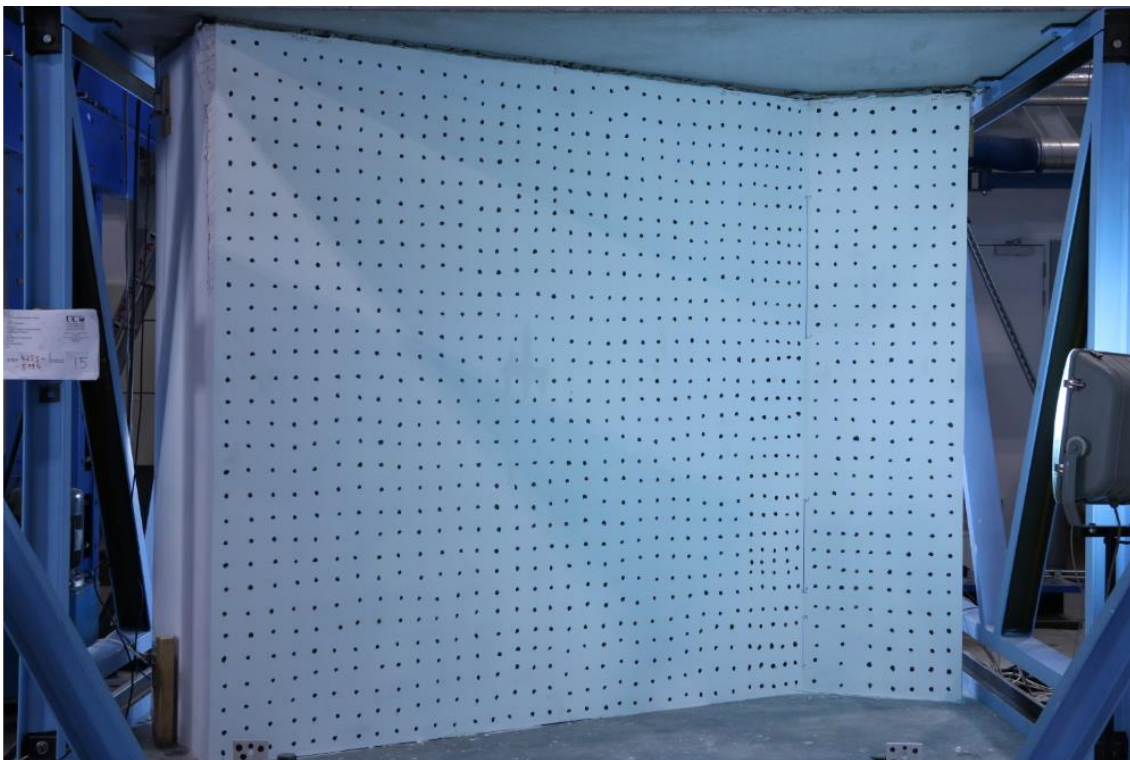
Specimen A2 – Specimen after completion of test prior to removal of linings
